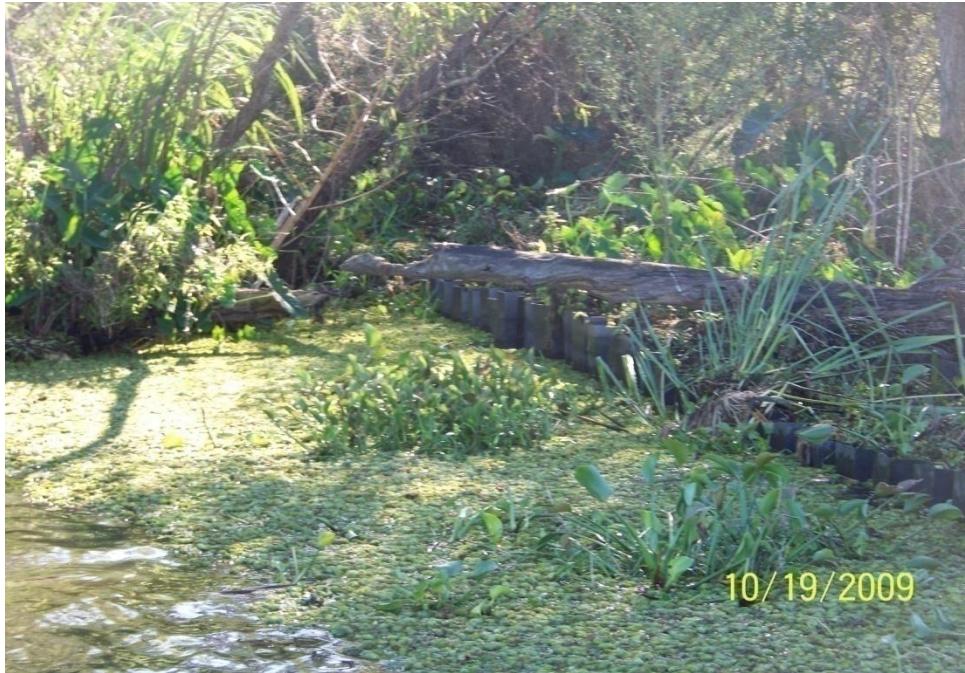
Site V2 – fiberglass sheet pile wall tie-in to bank on the east end of the structure.
